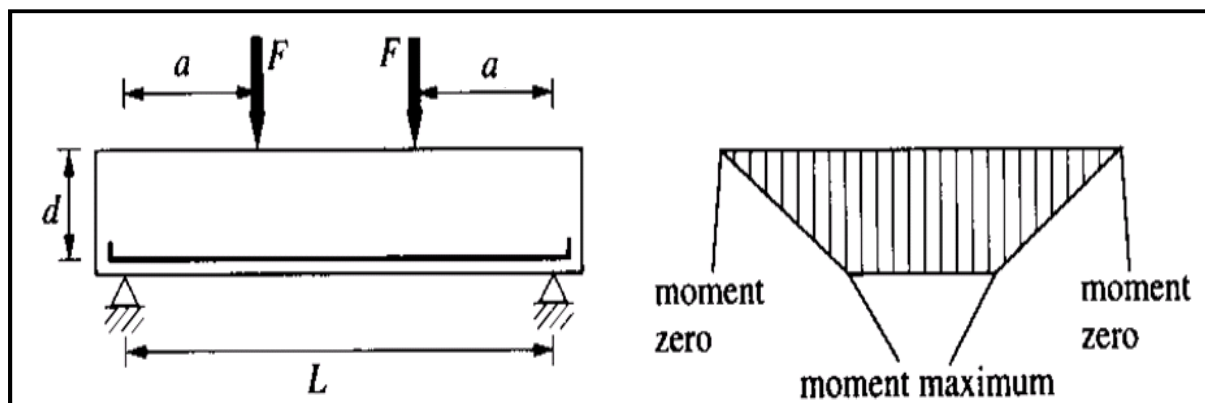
Typical test arrangement and bending moment diagram for member without shear reinforcement (O'Brien & Dixon, 1995)
